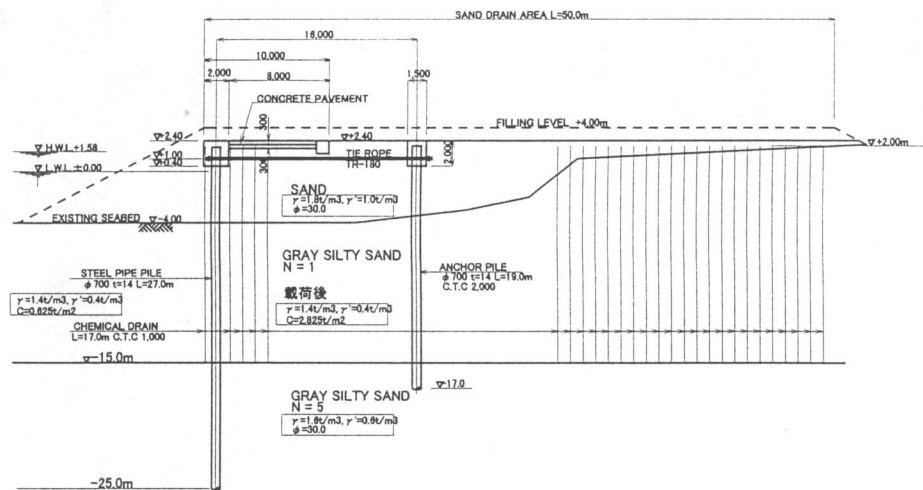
Anchored steel pipe pile type wall with soil improvement at rear of the wall
